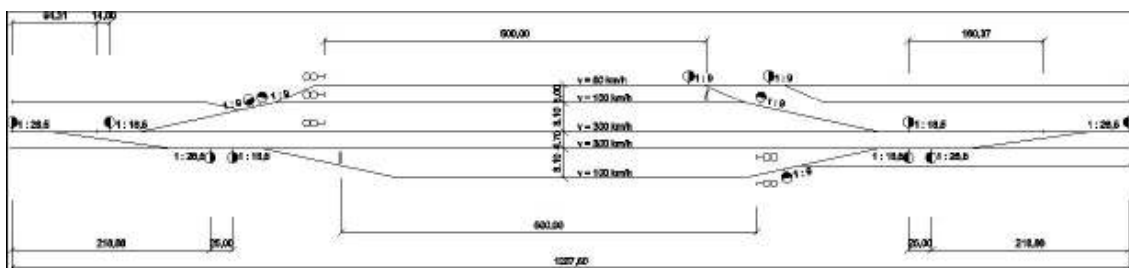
Disposition of the switches next to a high speed railway station [1]
